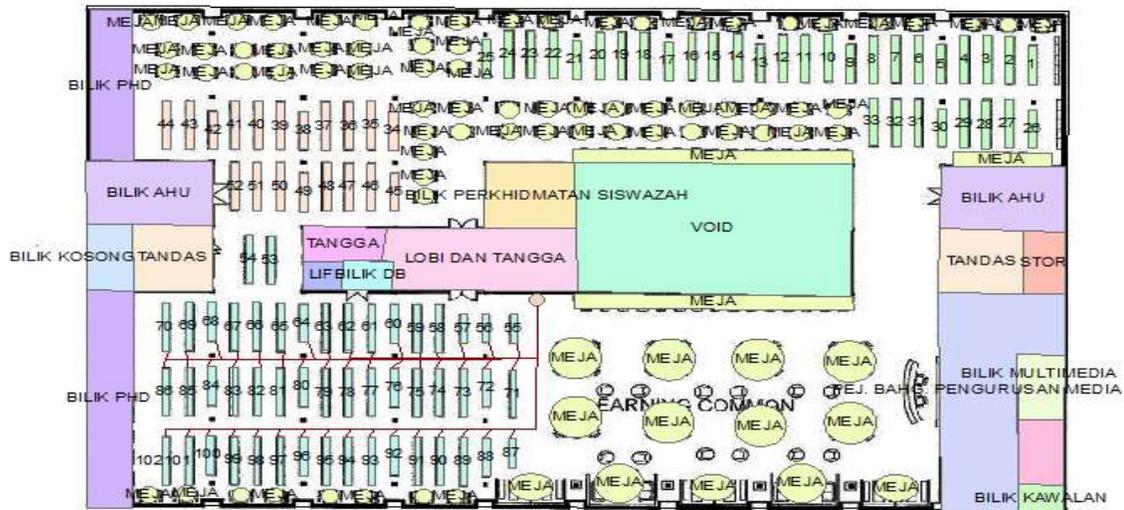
Result of digitizing the floor plan of PTAR 1 at level 5
